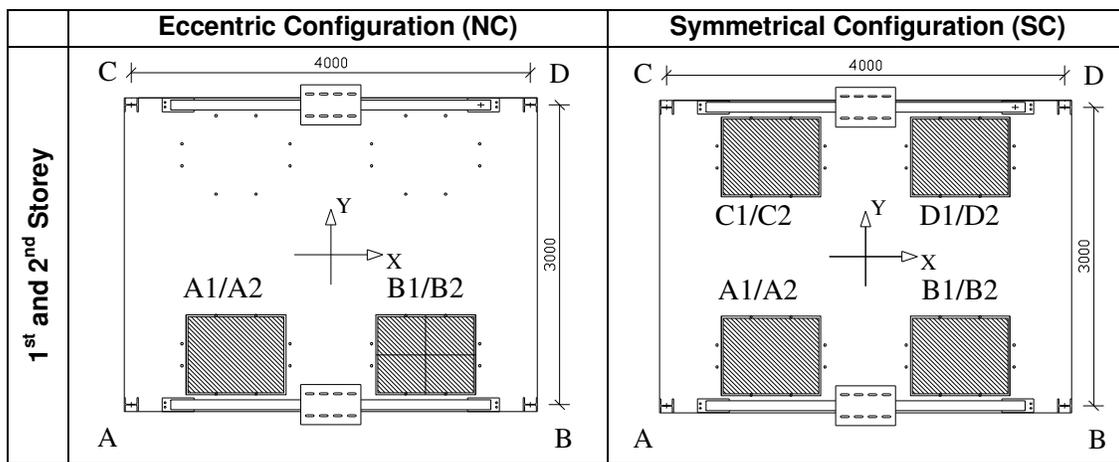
Concrete block positions for symmetrical (SC) and eccentric (NC) mass configurations
